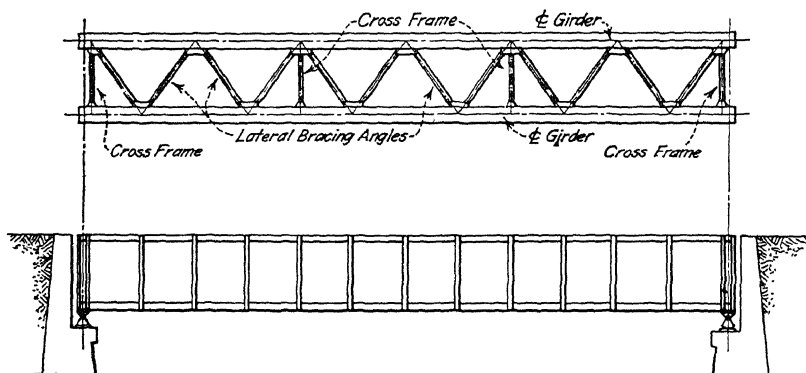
Plan and Elevation of Railroad Deck Girder Bridge,
